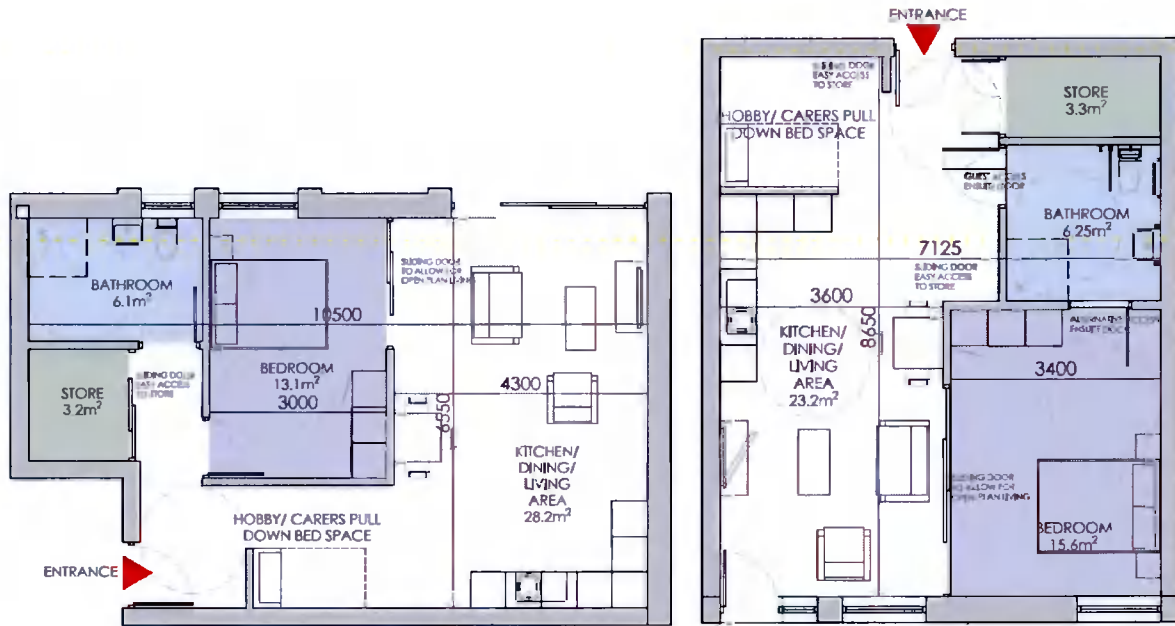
Typical ground floor plan of the independent living blocks House Type 3 (left) and 4 (right).
